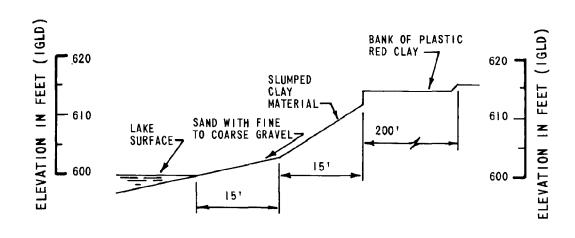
TYPICAL BEACH CROSS SECTION - REACH NO. 2
